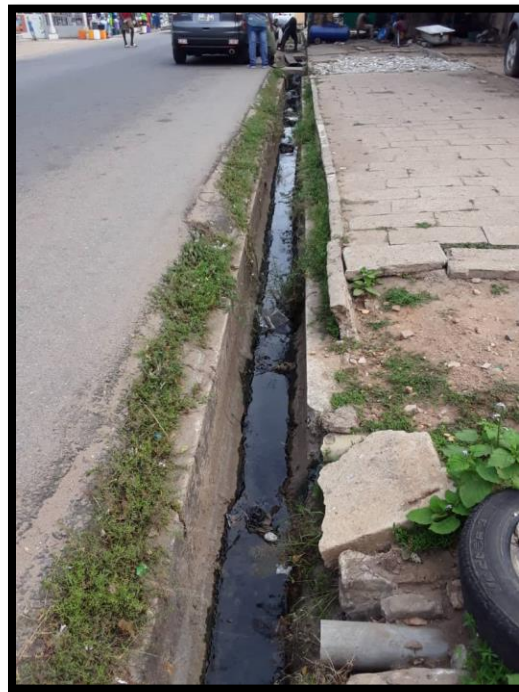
Uncovered Gutter at a Section of Oxford Street (Photo by Walter Ashong, 2020)
